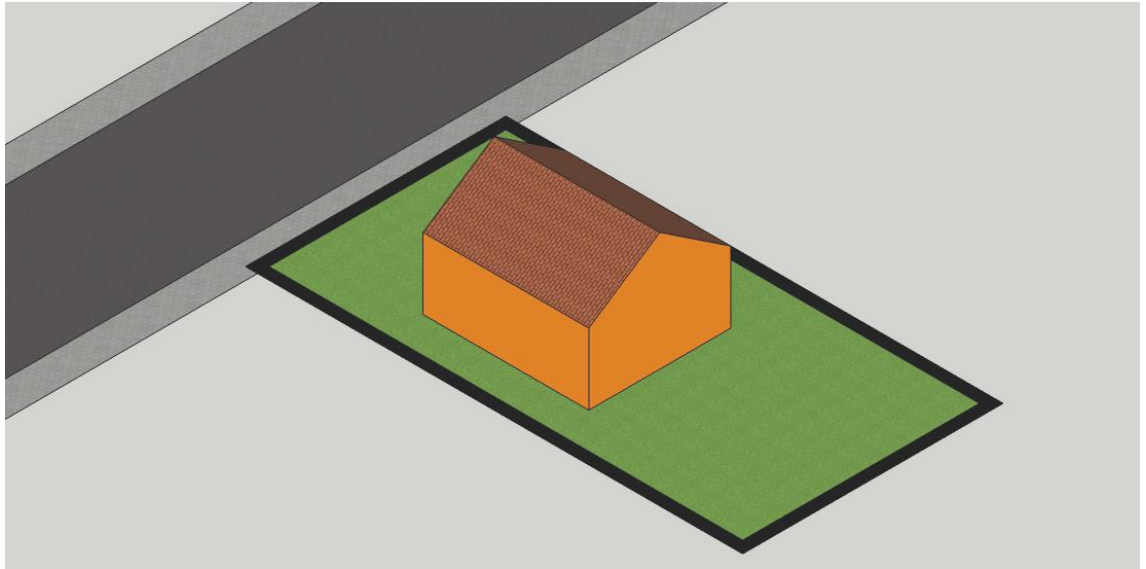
Sample of roof pitching to the sides of the plot.
